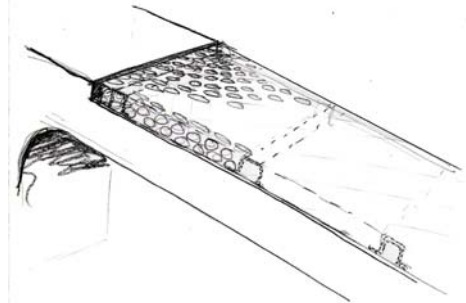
Bench without backrest. Detail. (Author, 2008)
